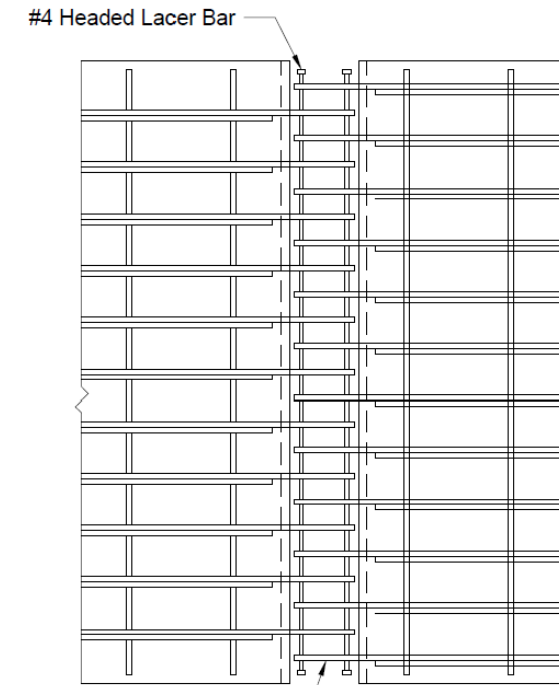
Cross-Section of Fully Precast Bridge with Two-Unit Panels
